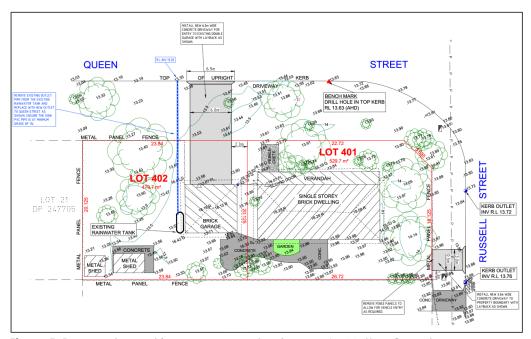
Proposed new driveway access plan (source: Le Mottee Group)
